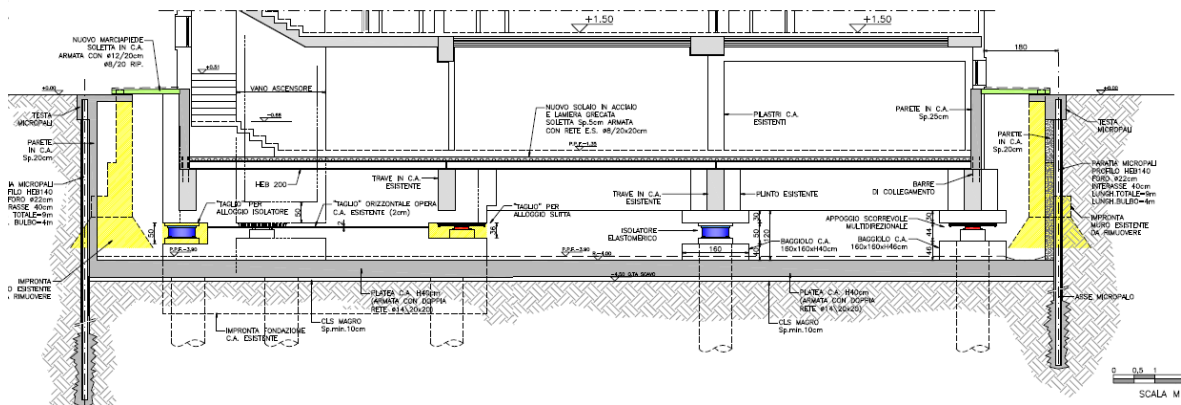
Cross section of the building in via Di Vincenzo 23 A at the basement/foundation level.
